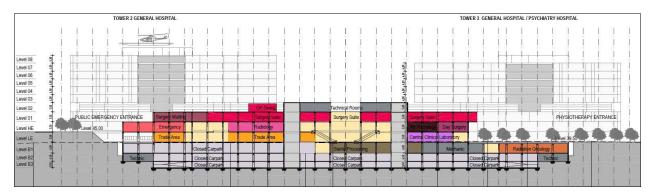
Cross sectional view of Tower 2: General Hospital and Tower 3: Psychiatric Hospital
